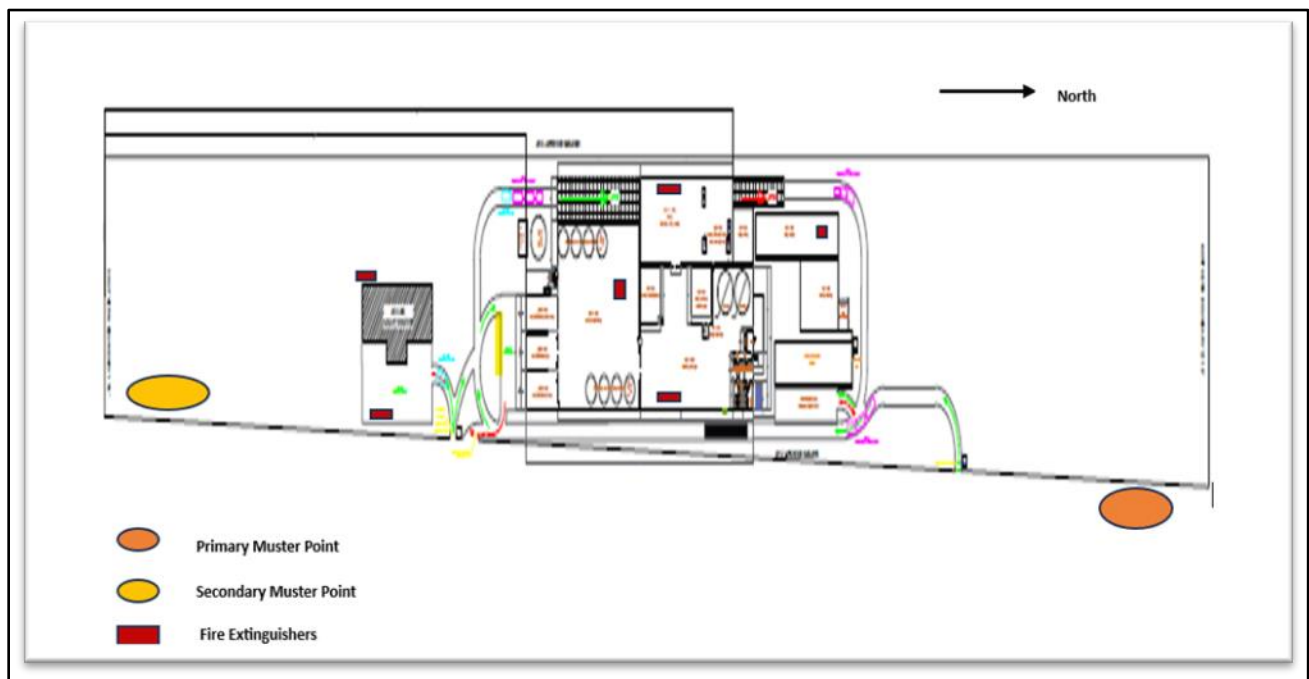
Site Layout with Proposed Muster Point and Fire Extinguisher Locations
